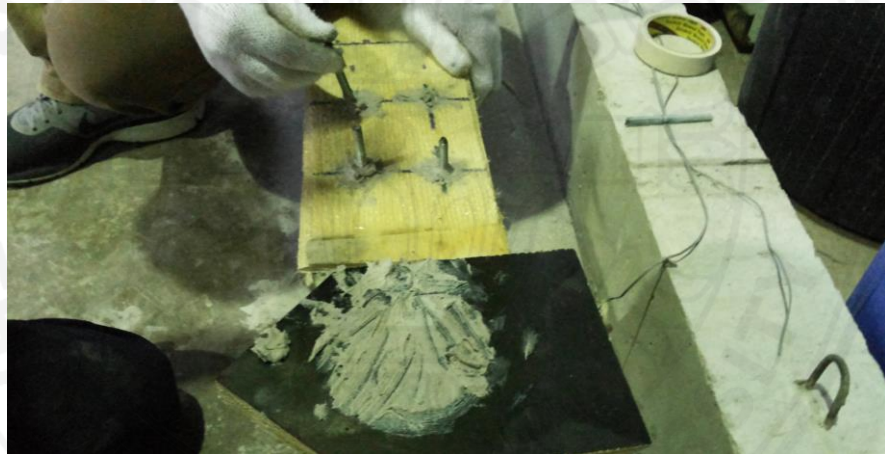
Typical anchorage details for sisal FRP strengthened RC beams
